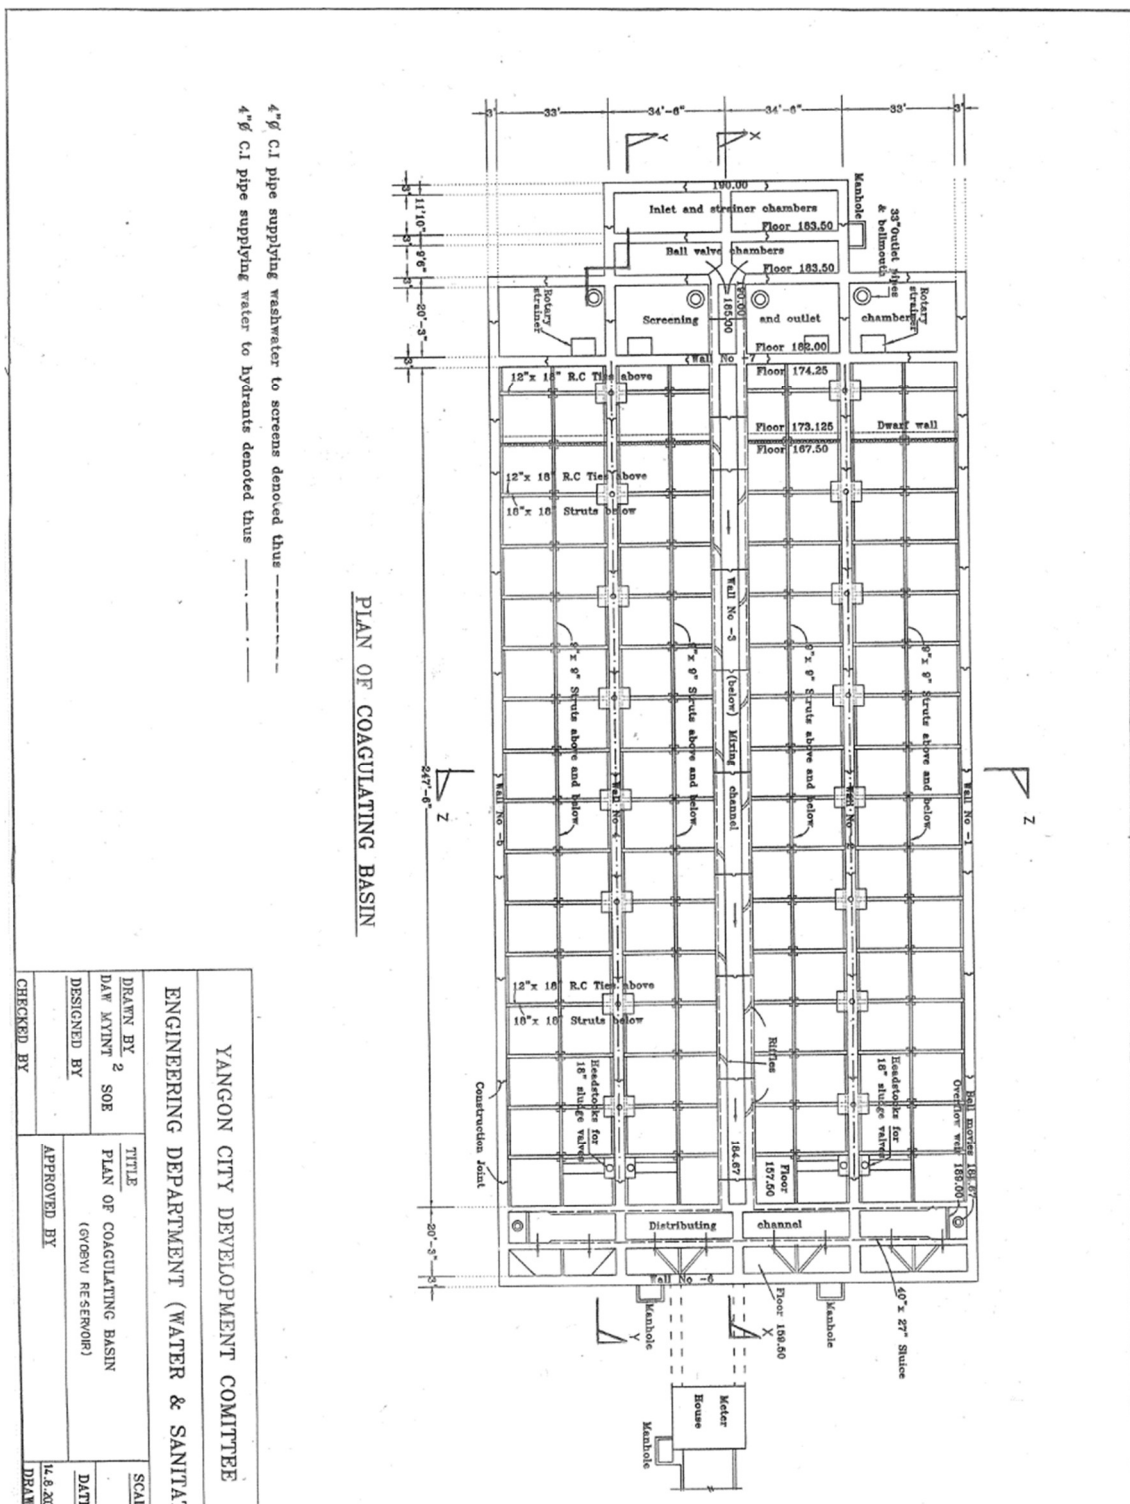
Plan view of Gyobyu reservoir treatment facility
